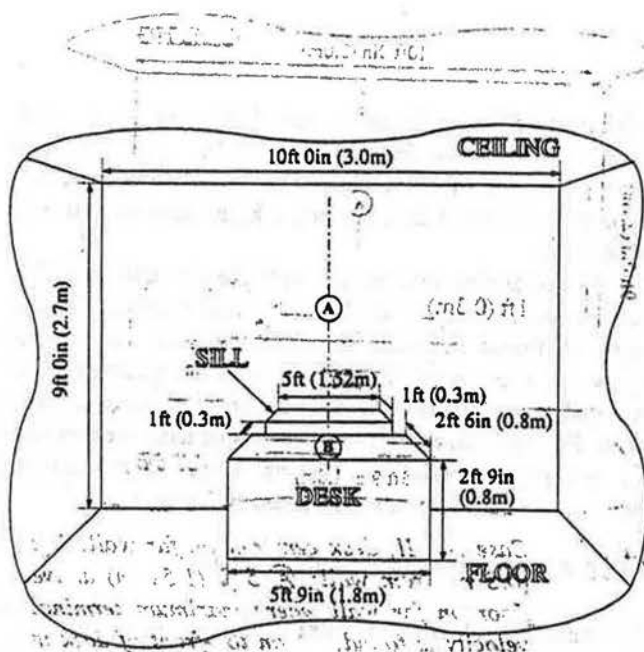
Case No. IV, desk and window sill centered on far wall, desk 1 ft (0.3 m) from sill; A 5 ft (1.52 m) above floor on far wall where maximum terminal velocity is found, B on top front of desk in line with A.
